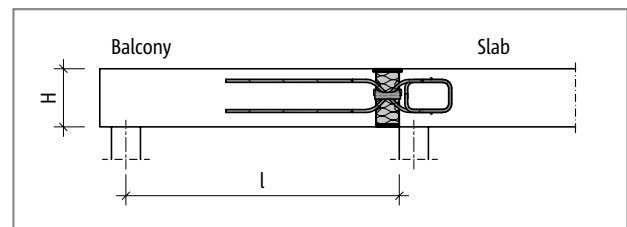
Schöck Isokorb® T type Q-E-W-VV: Static system
